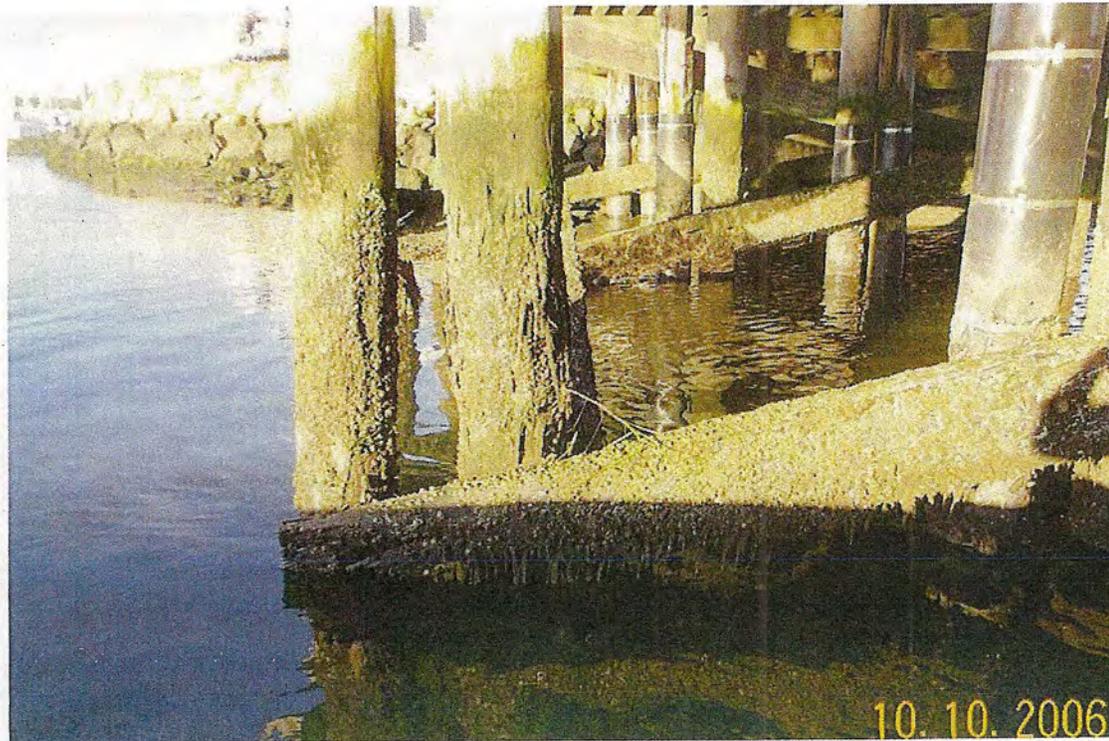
Typ. condition of timber piles/bracing, south end of Bent 3, looking west. Note protective sleeve repairs on other piles in view.
